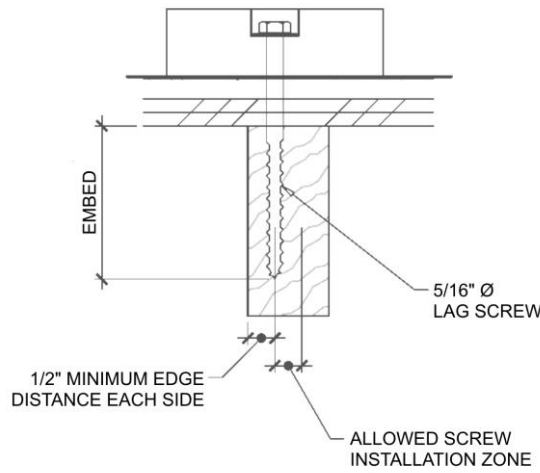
TYPICAL ANCHOR WITH LAG SCREW ATTACHMENT
